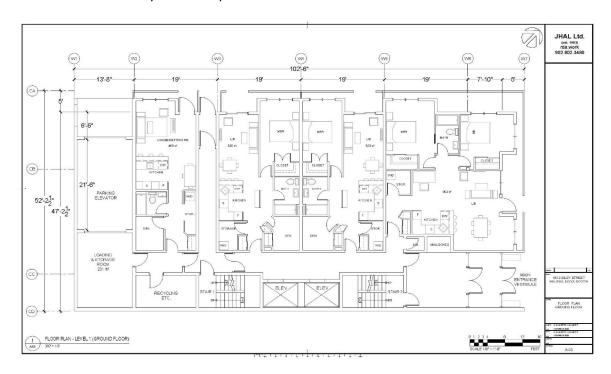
5512 Bilby Street Proposed Ground Floor Plan
